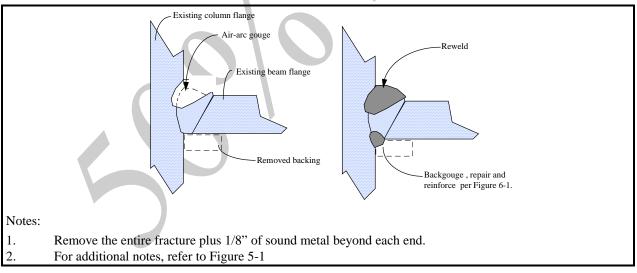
Gouge & Re-weld of Fractured Weld
